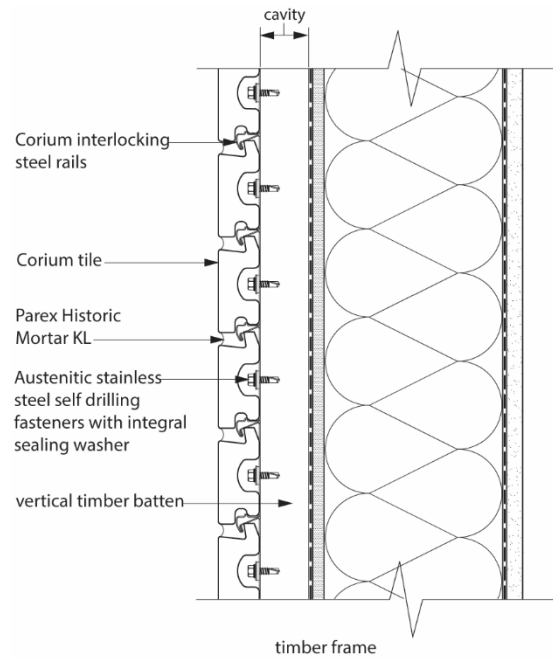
Typical installation details of the Corium Brick Tile Cladding System (continued)
